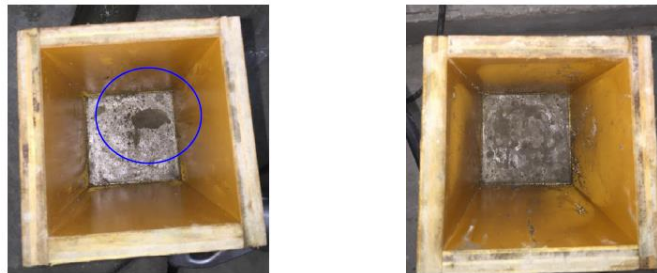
Damaged and undamaged concrete surface with different elapsed time
